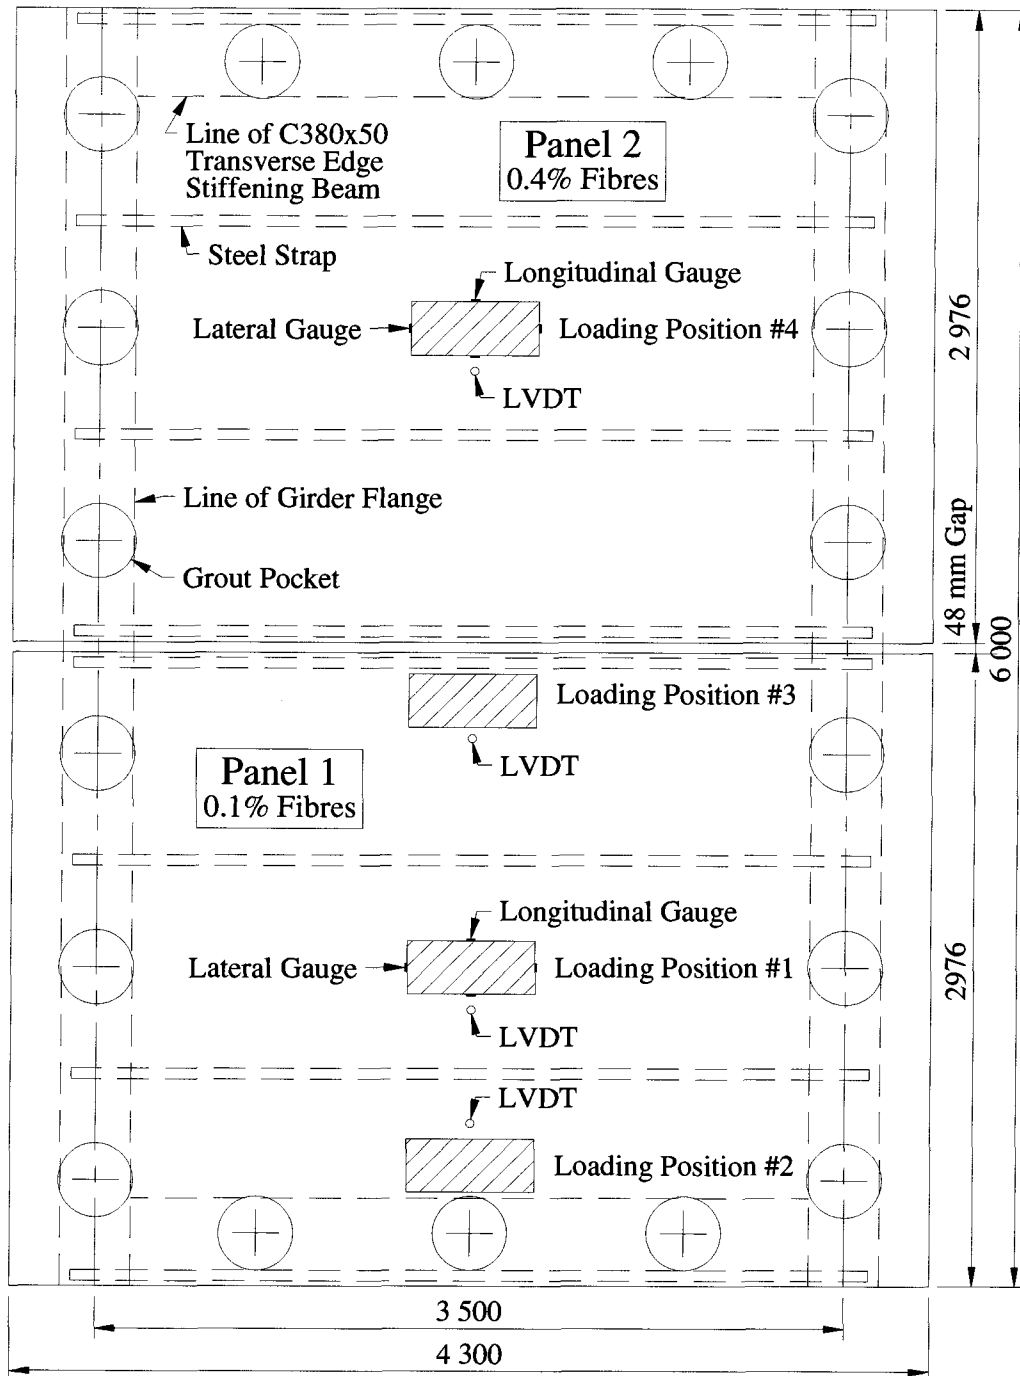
Plan of Test Panels, Showing Location of Load Patches and Instrumentation
